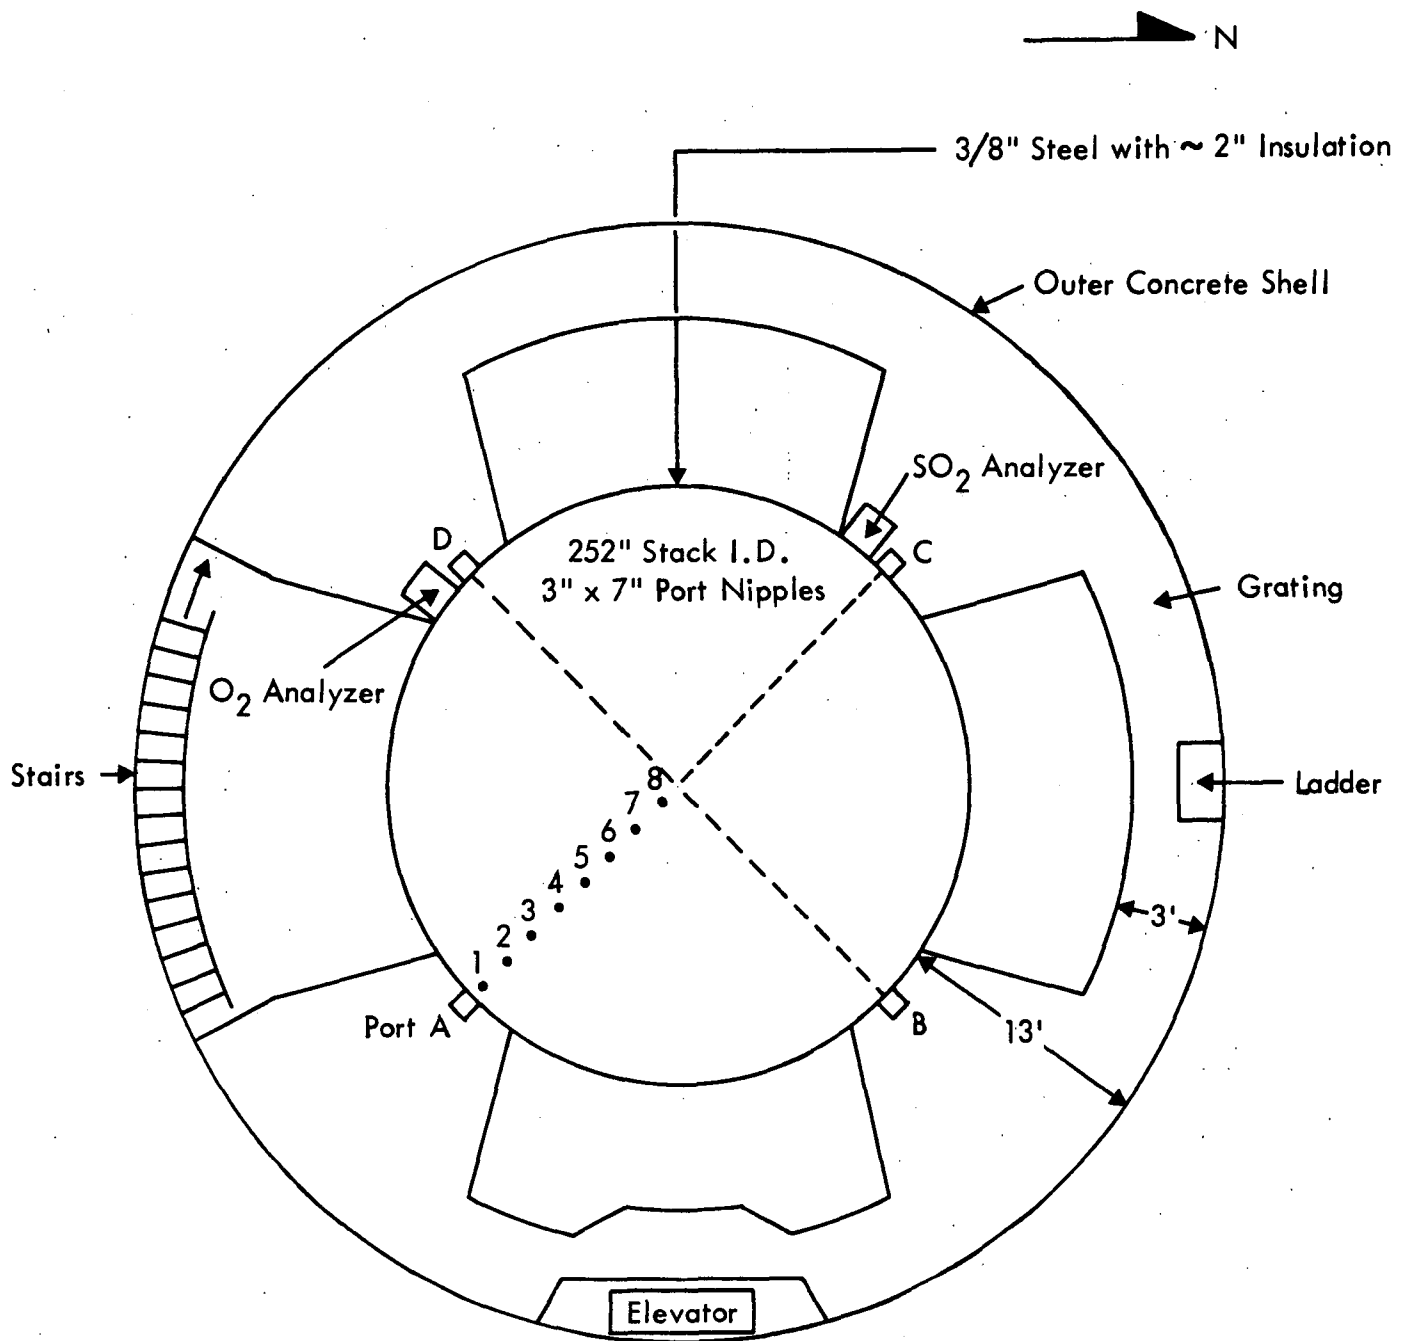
Horizontal stack cross section and traverse point locations, Plant No. 5.
